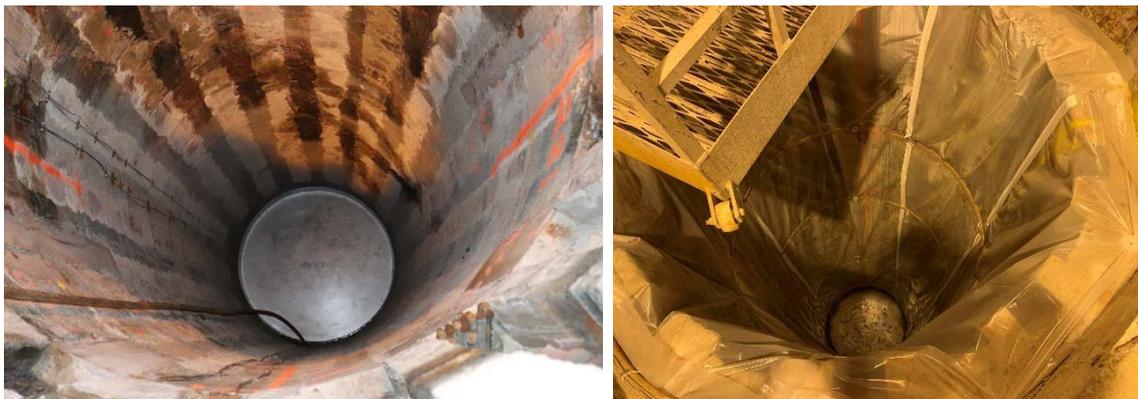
Left: The stainless plate in place in the bottom of the test hole. Right: Plastic tube attached to the plate and the test hole.
